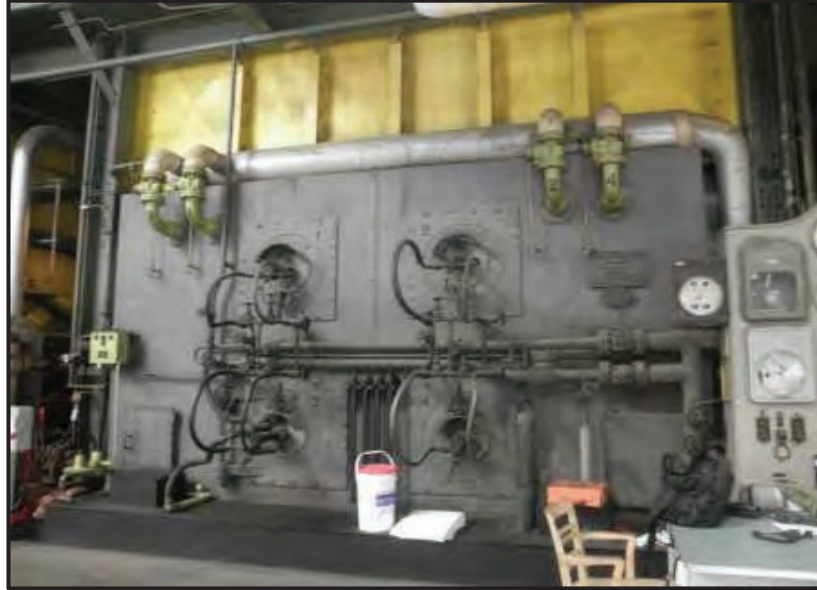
Overview of Basement Floor Level, View Looking North (Photo by J. Terry).
